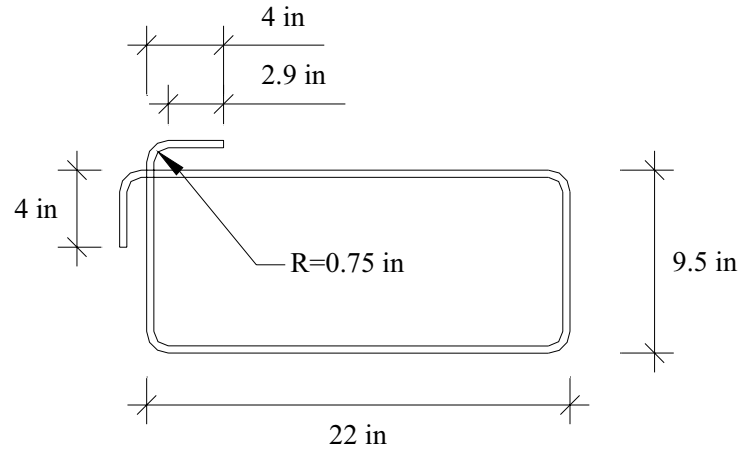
Tie Type B; Specimens B1, B2 & B3
